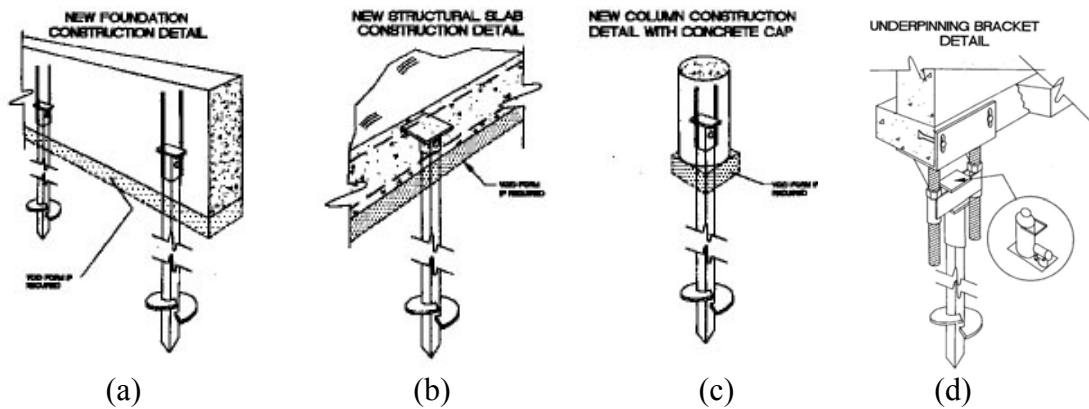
Examples of Concrete to Pile Shaft Load Transfer Devices
